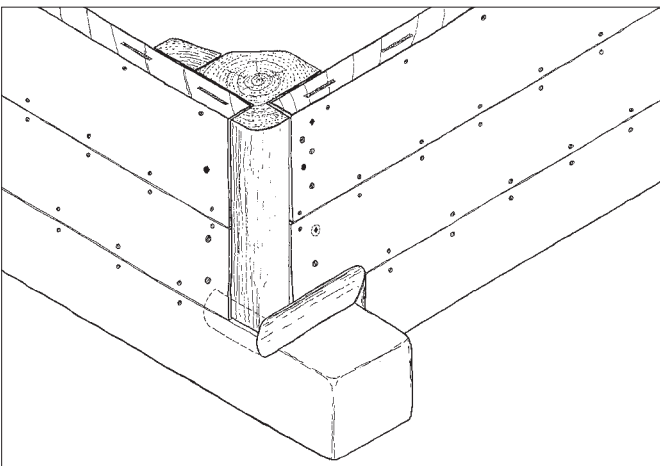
External corner detail with cover-piece over junction of chine beams, Area A caisson, Caesarea (C. J. Brandon).
